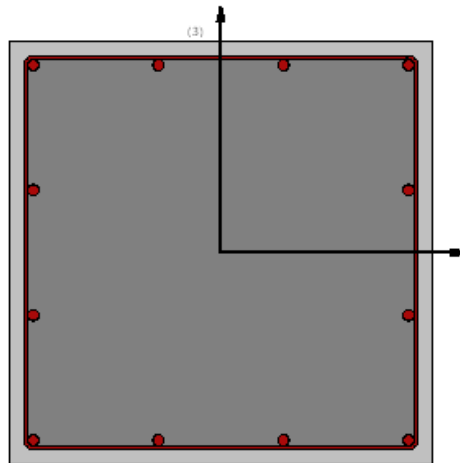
Rectangular column 0.75x0.75 (12 No.20) for floor (1, 2, and 3).
